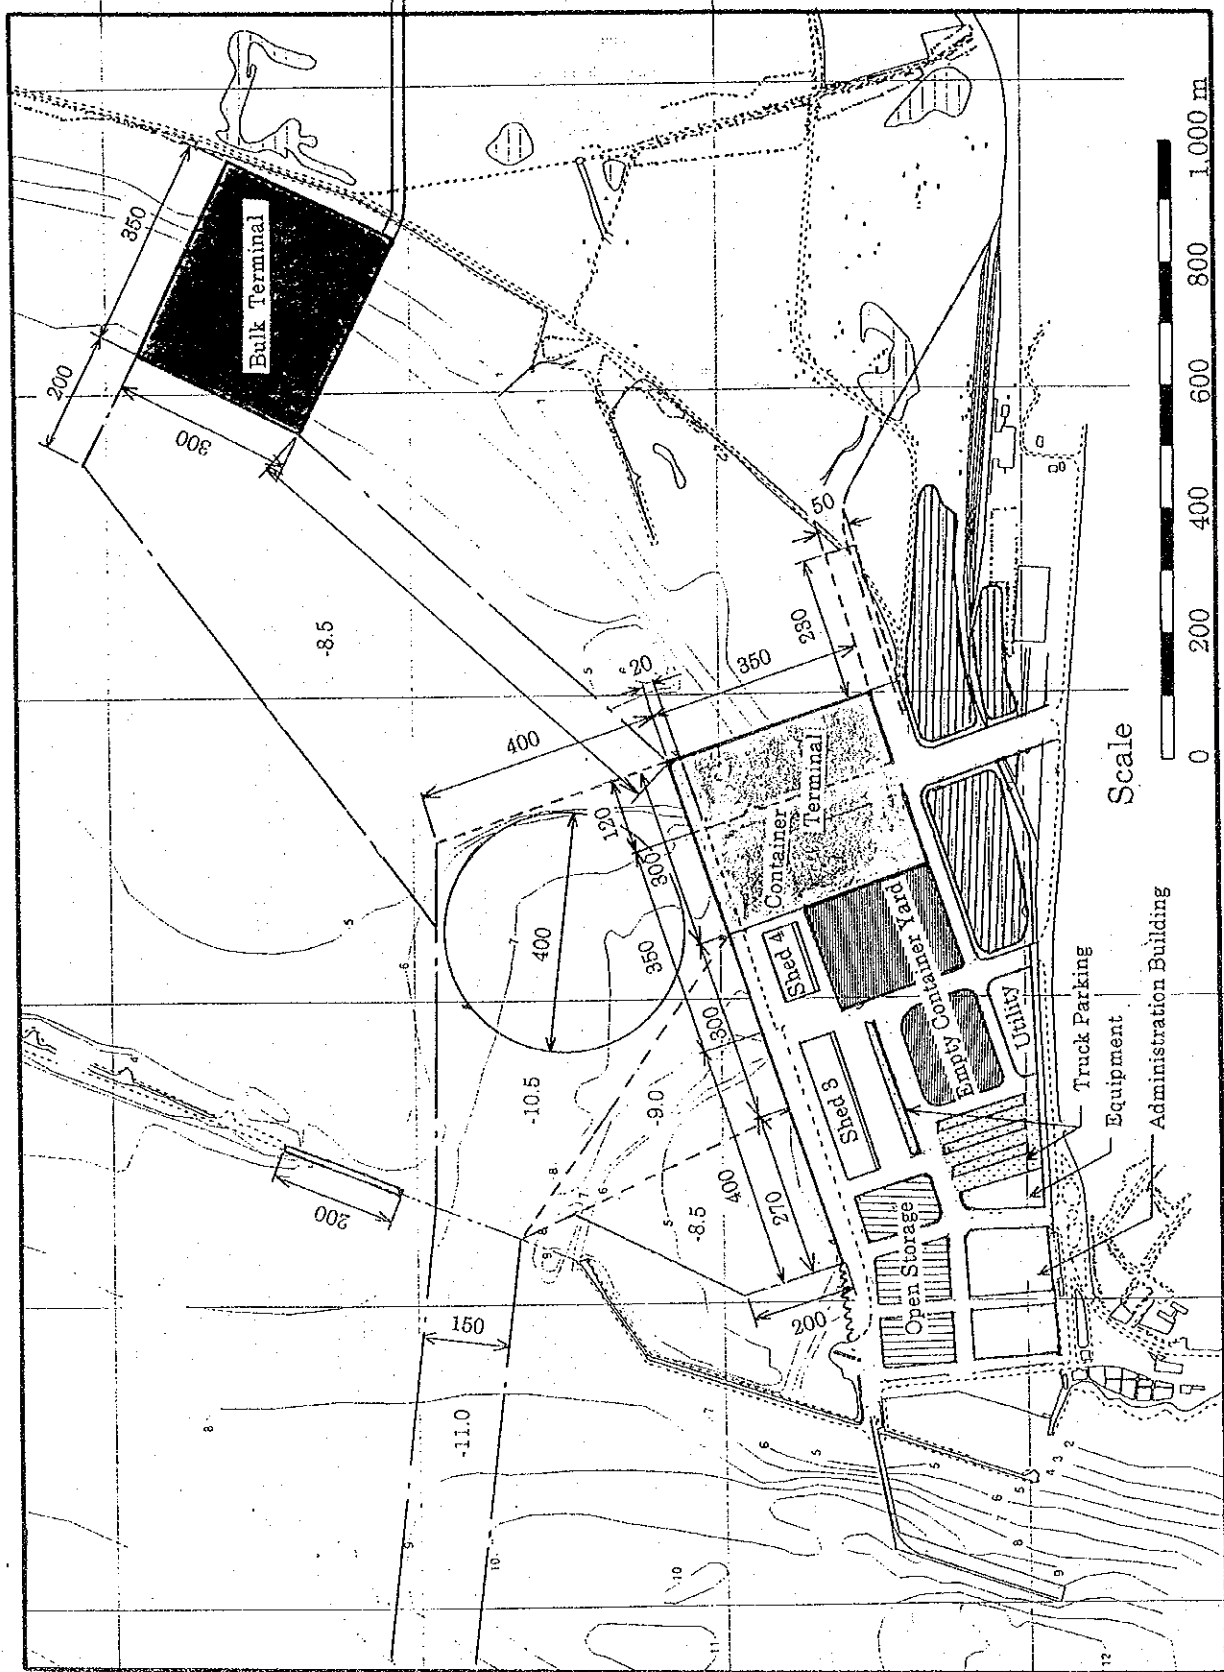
The Long-term Development Plan (Low Cases, Plan - 1)
